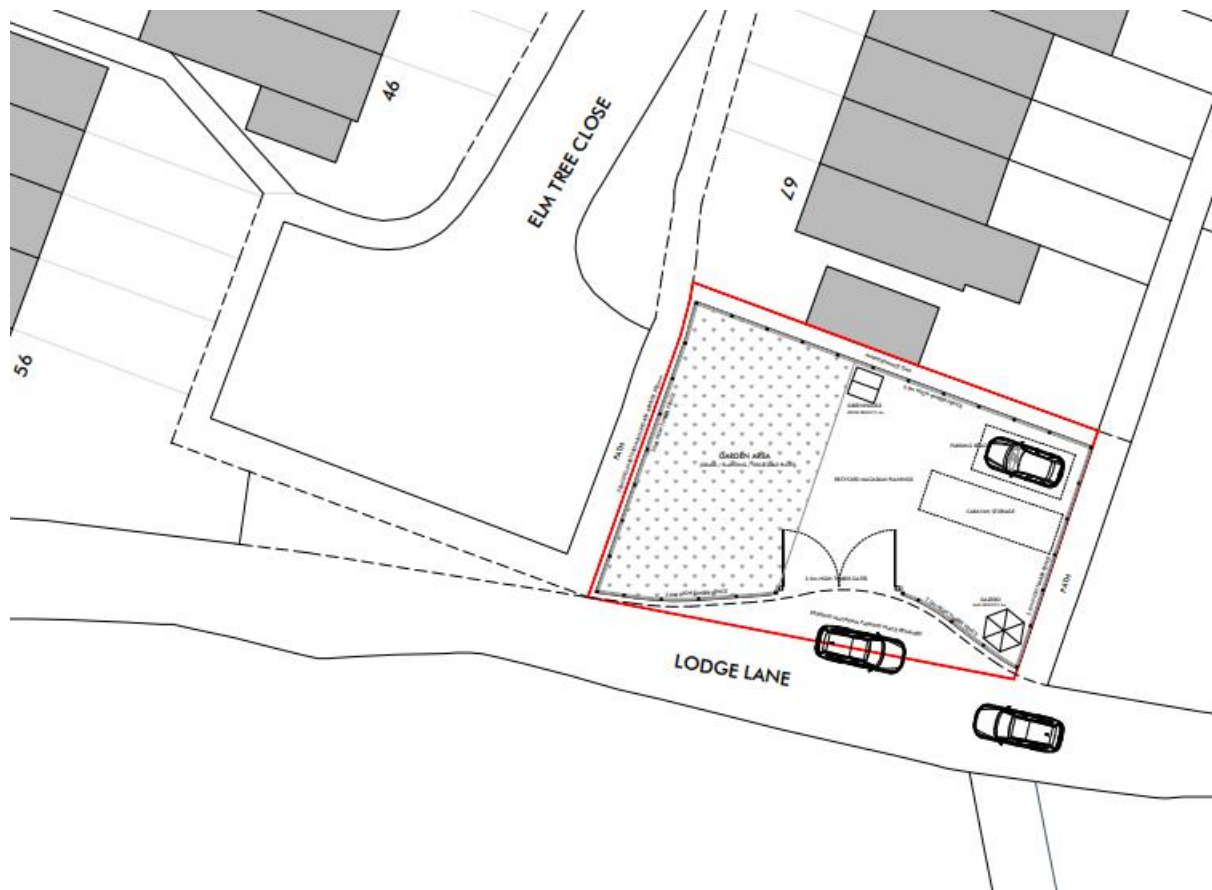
Proposed Site Plan (Dwg no. 200, SK Design)
